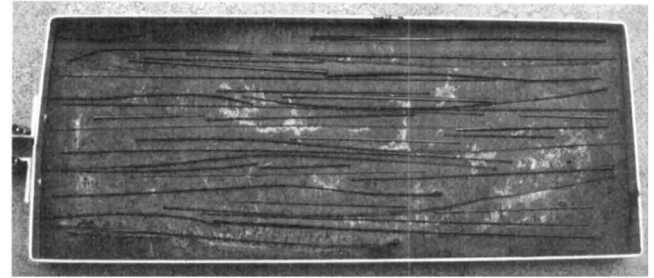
Longitudinal glass fibre reinforcement in sulfur concrete [70].
